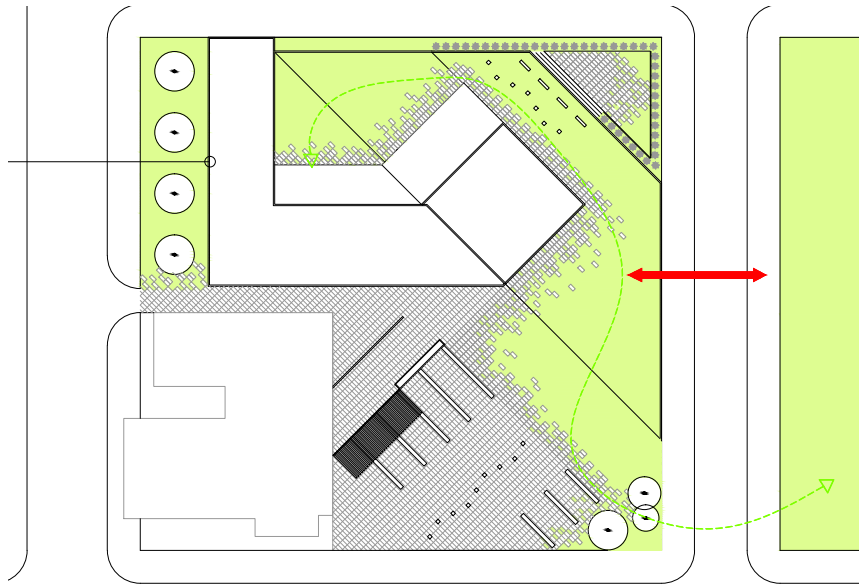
The green roof extends from the plaza to a roof terrace (Ian Austin).
